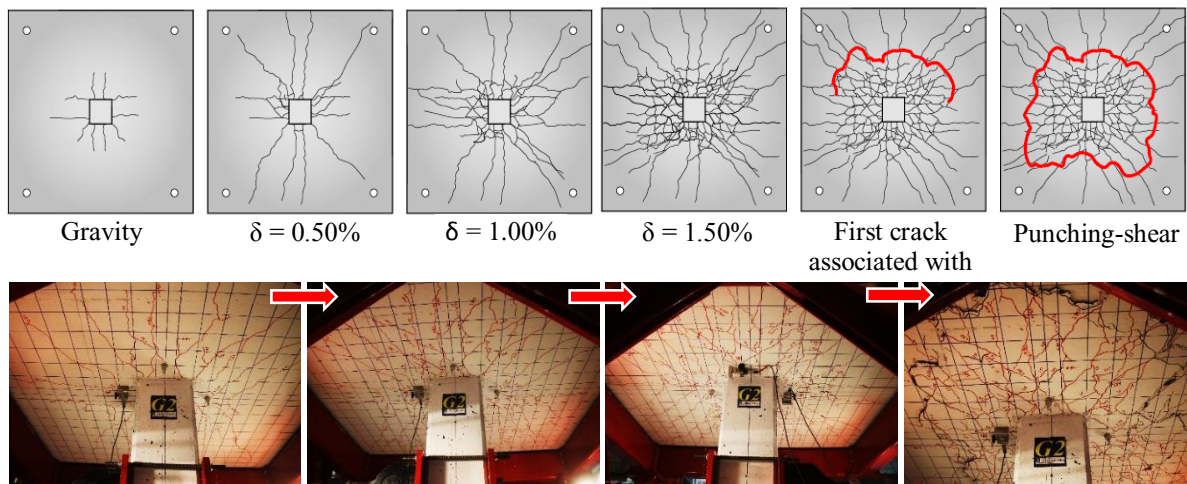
Typical crack patterns and failure sequence of the tested specimens.
